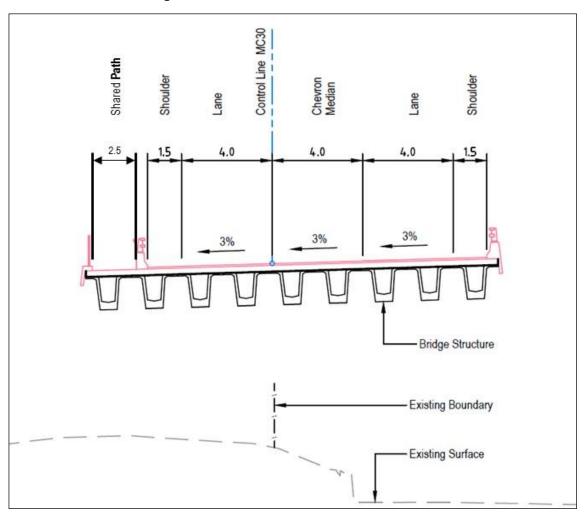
Typical Cross Section on Bridge Source: KBR Pty Ltd
